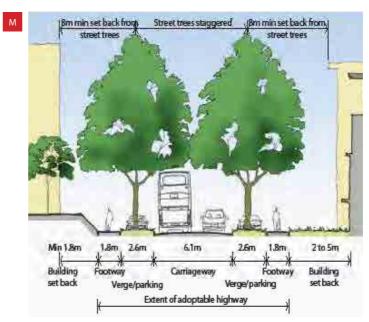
Section through Primary Road - Spine Road Southern Boulevard
